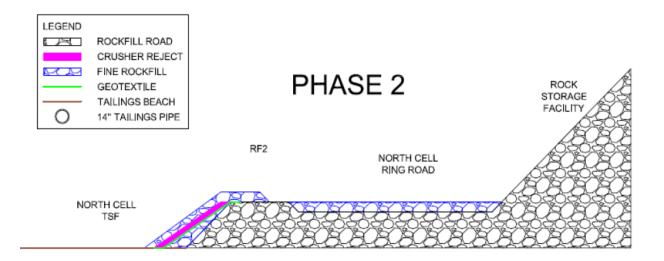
Typical Cross-Section of RF1/RF2
